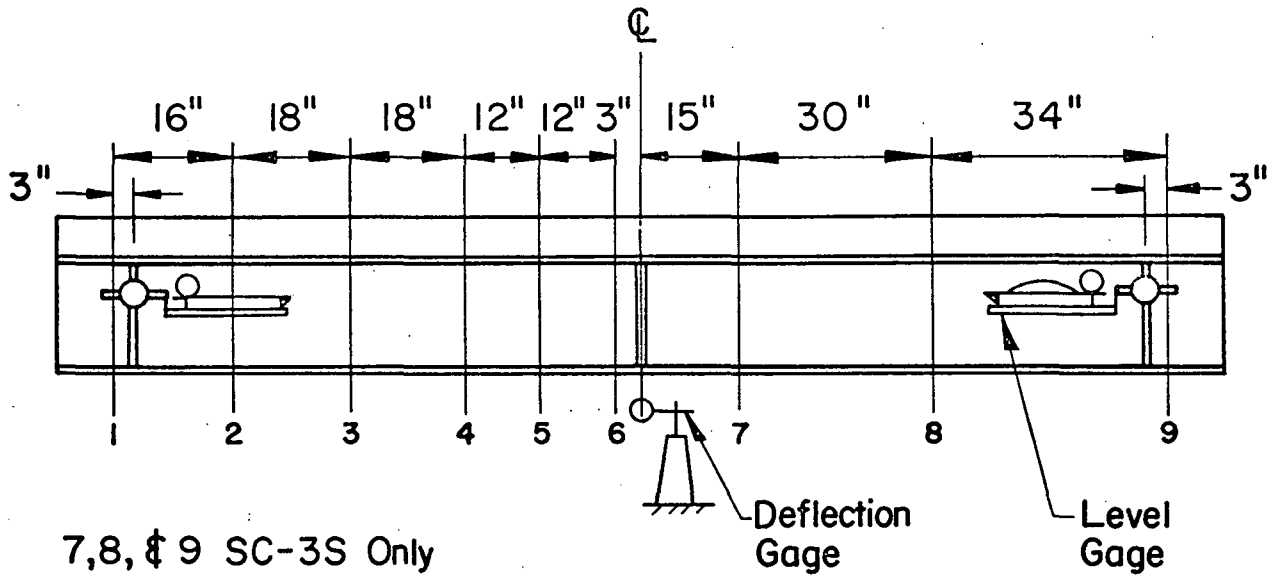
INSTRUMENTED CROSS SECTIONS FOR SC-3S, SC-4S TEST BEAMS
